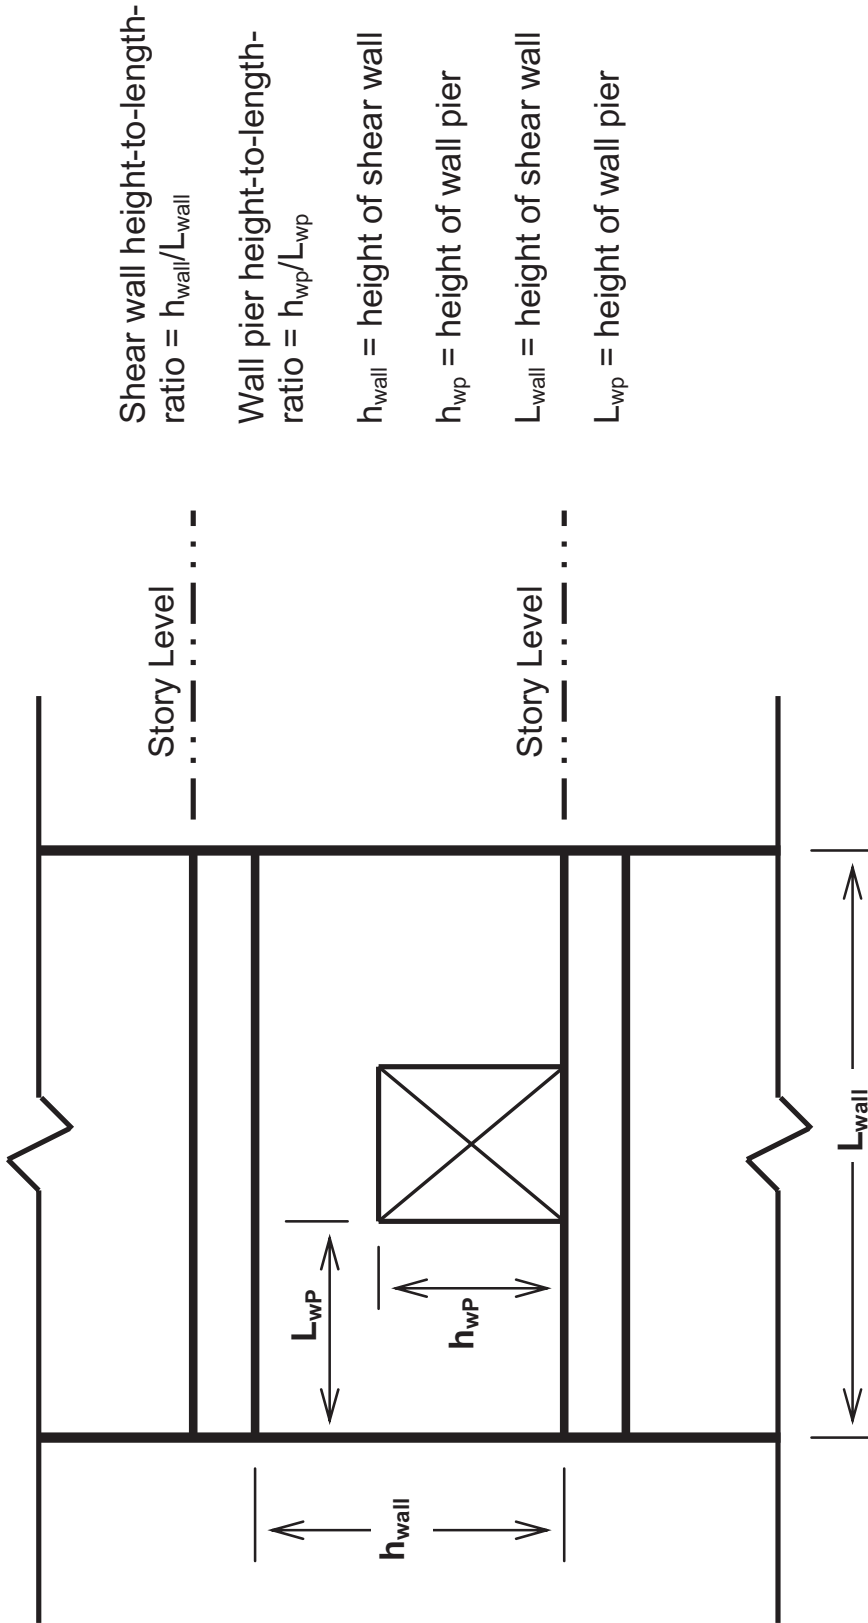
Shear Wall and Wall Pier Height-To-Length Ratio Determination
